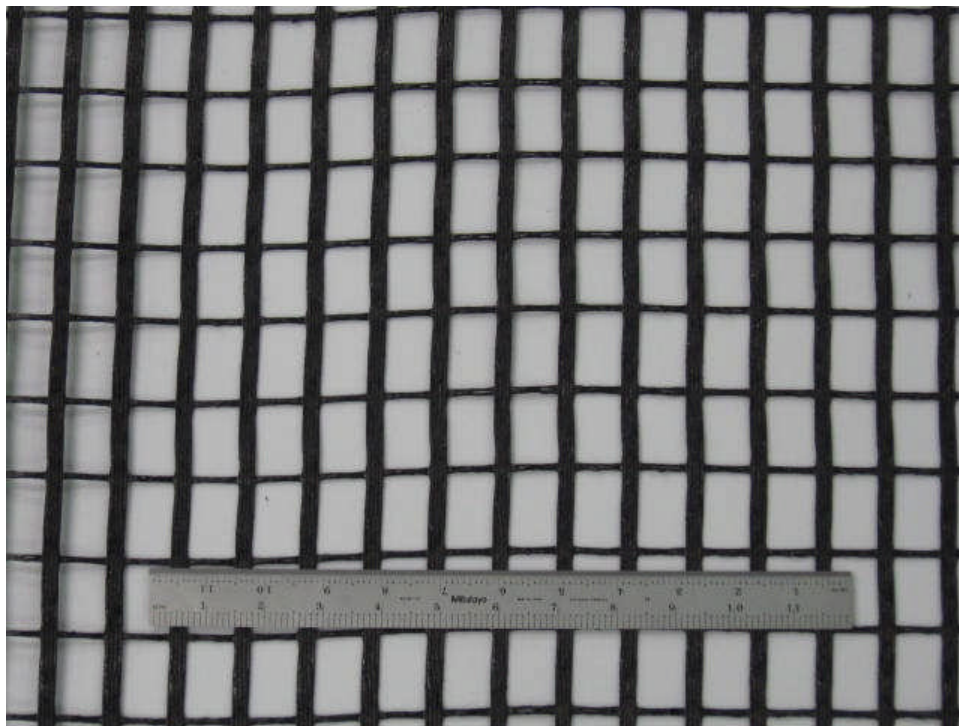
Photo of Miragrid 10XT (machine direction is perpendicular to ruler shown).
